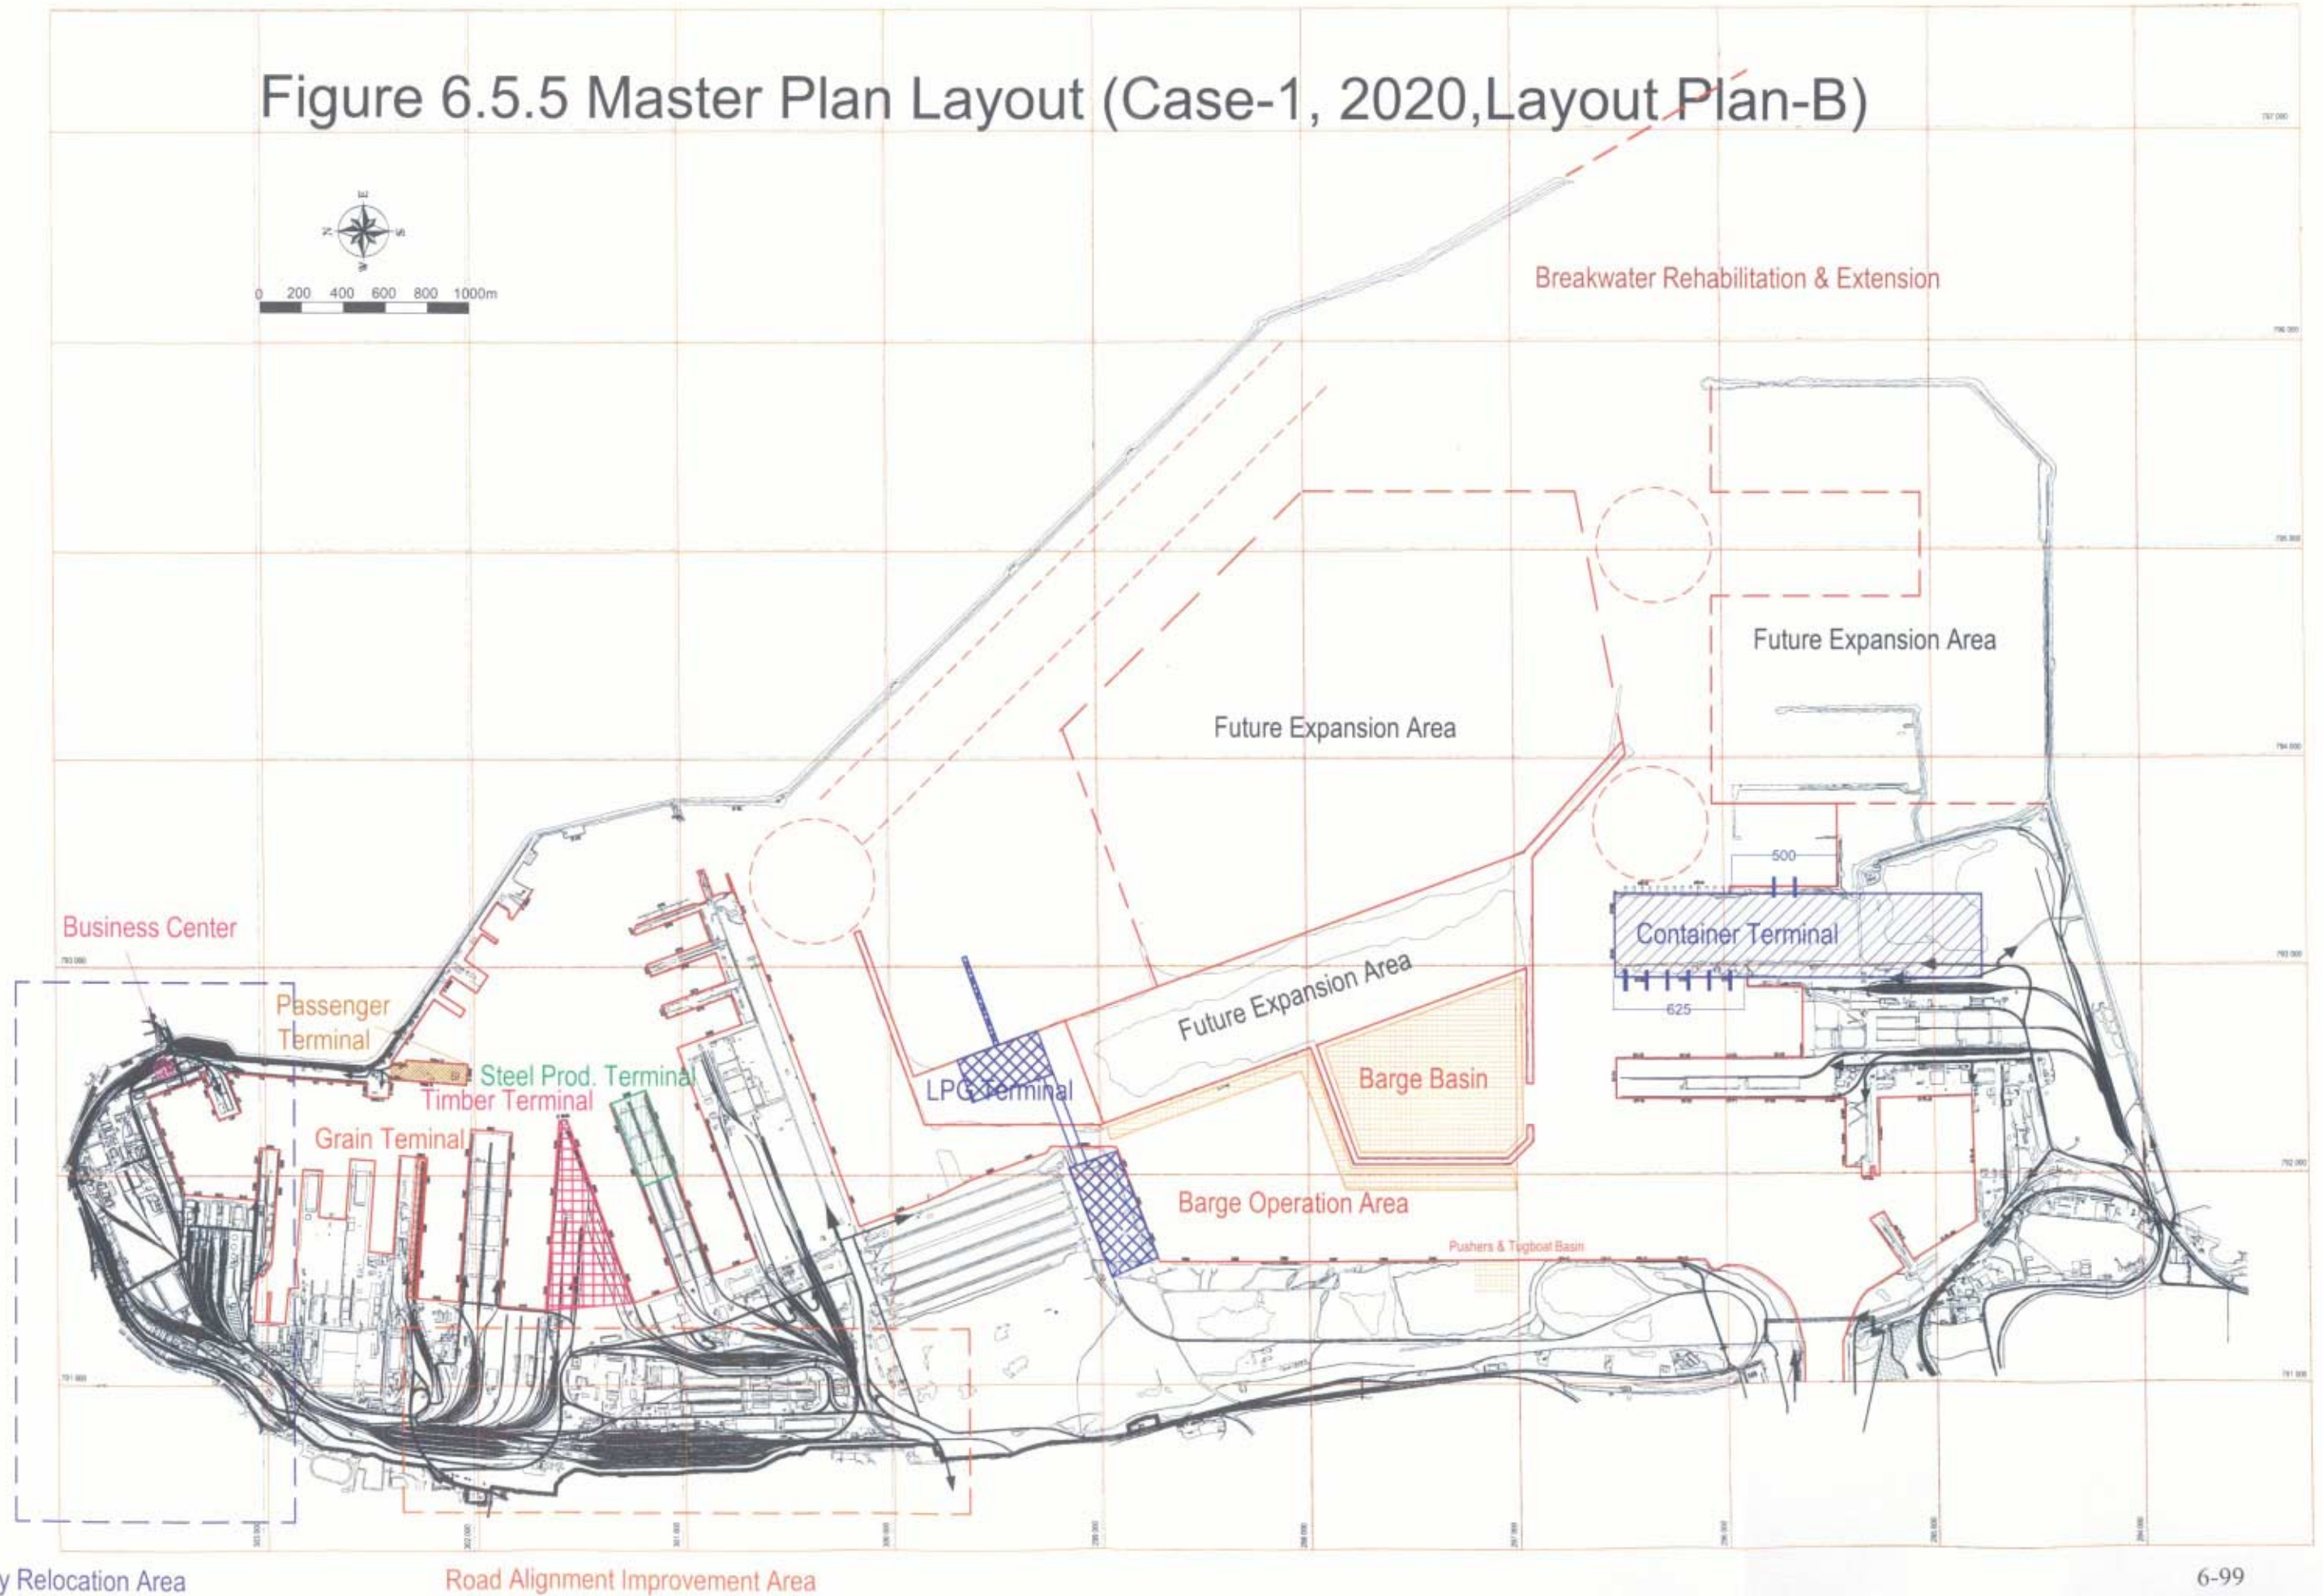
Master Plan Layout (Case-1, 2020, Layout Plan-B)
